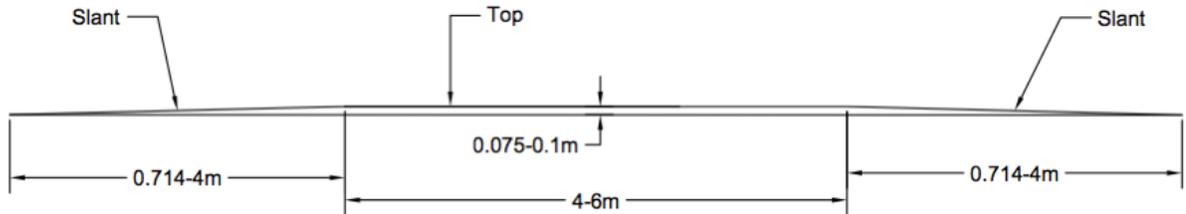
Cross section of the trapezoidal humps recommended in EAC.
